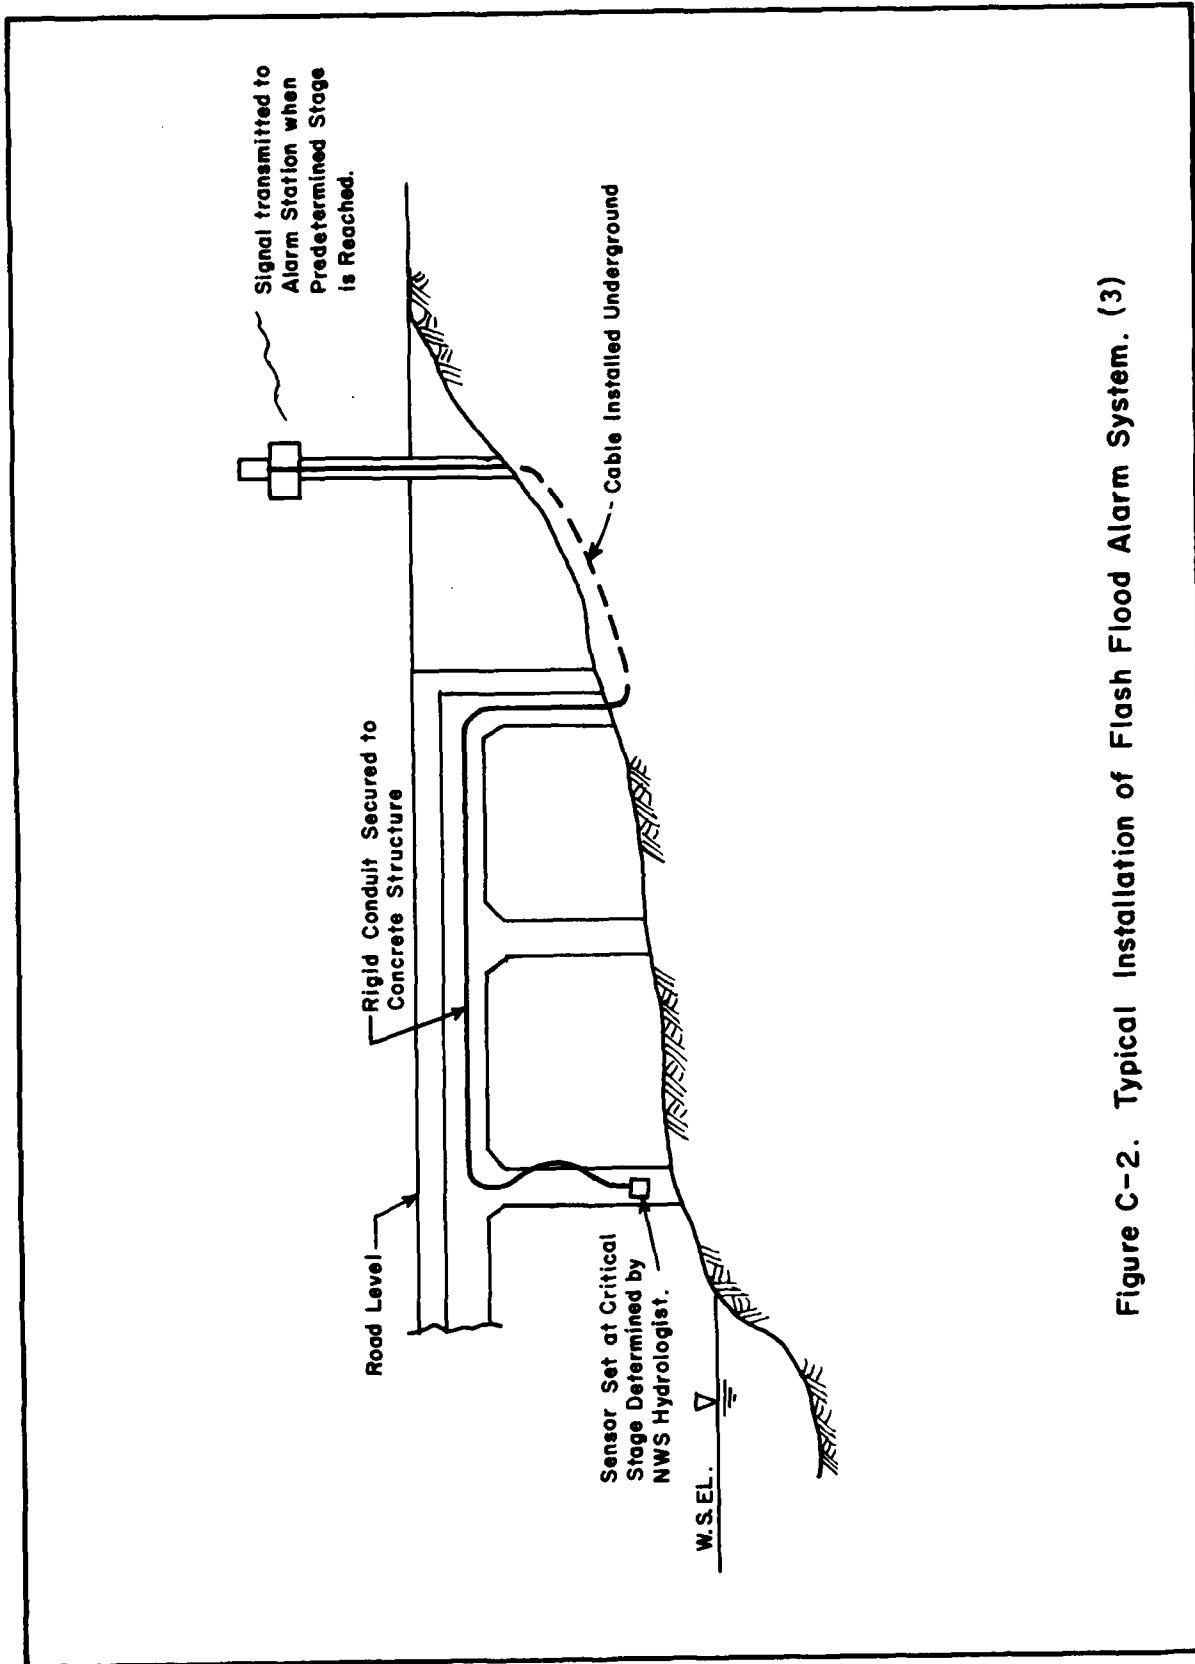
Typical Installation of Flash Flood Alarm System. (3)
